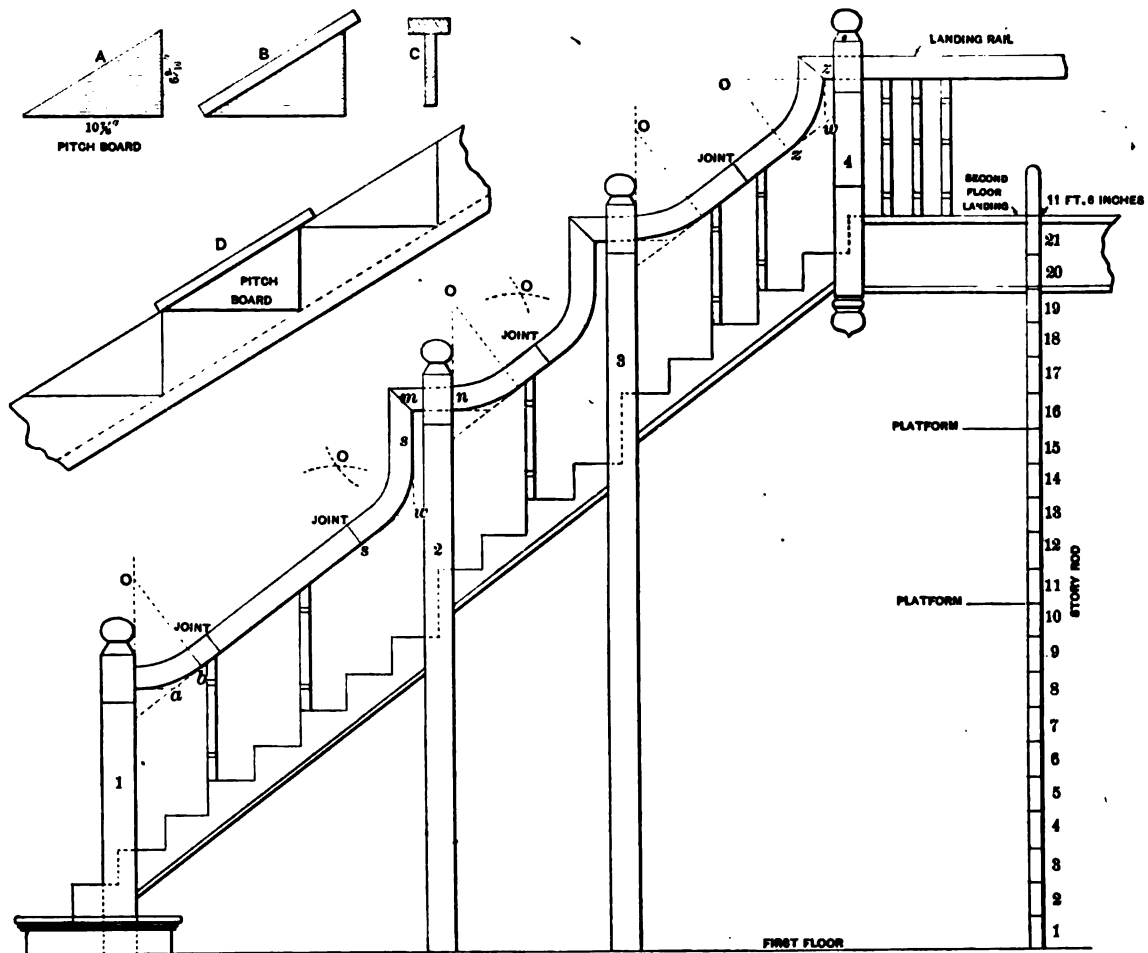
Elevation of Newel and Platform Stairway, Showing Pitchboard and Its Application.
